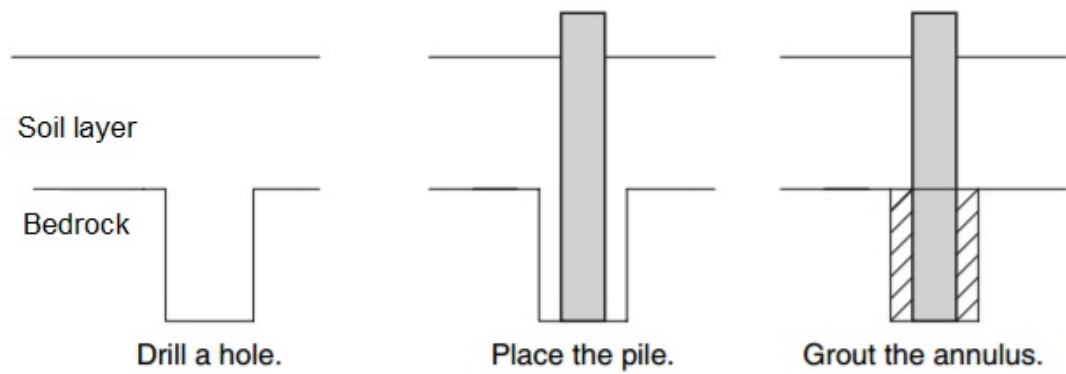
Drilling and grouting the pile into the bedrock (Rajapakse 2005)
